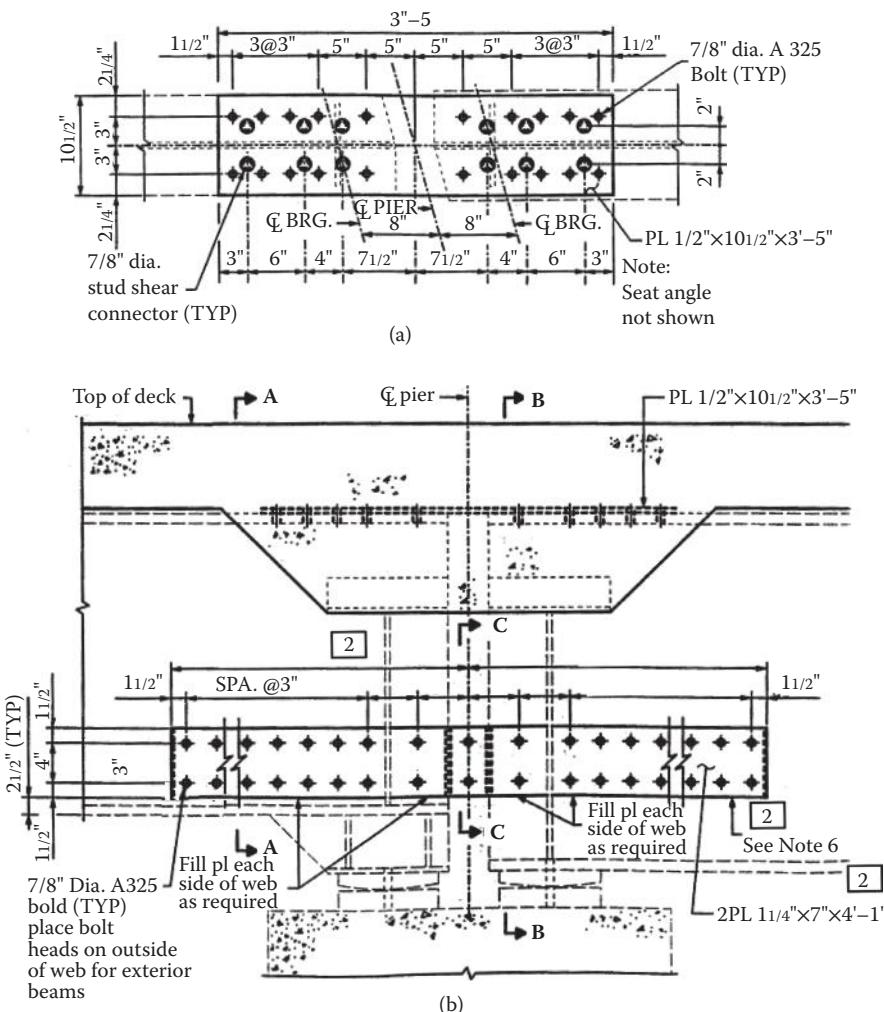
Example of continuity connection of steel plate girders: (a) plan, (b) elevation. (From BEST, *Study Report*, The Bridge Engineering Software and Technology (BEST) Center, University of Maryland, College Park, MD, 2000.)
